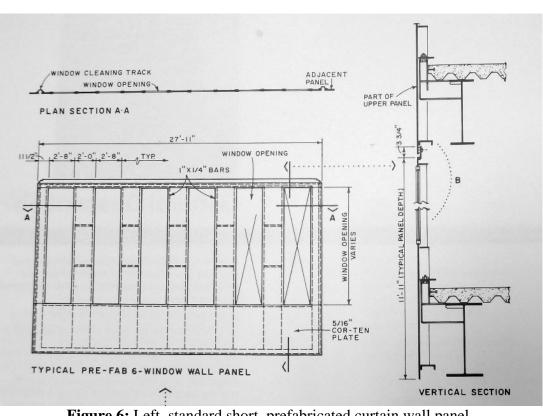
Left, standard short, prefabricated curtain wall panel (Structural Report. "Ruan Company Archives").
